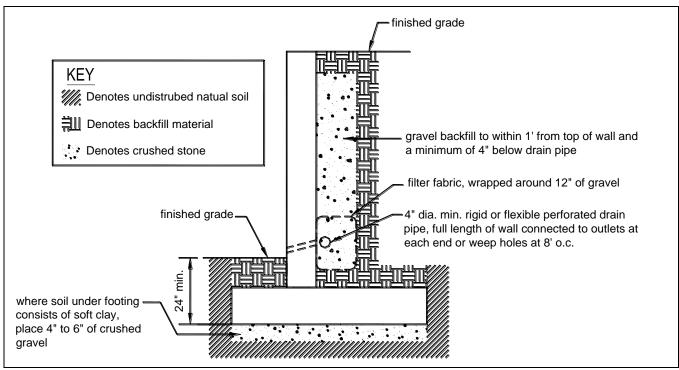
TYPICAL BACKFILL AND DRAINAGE DETAIL
